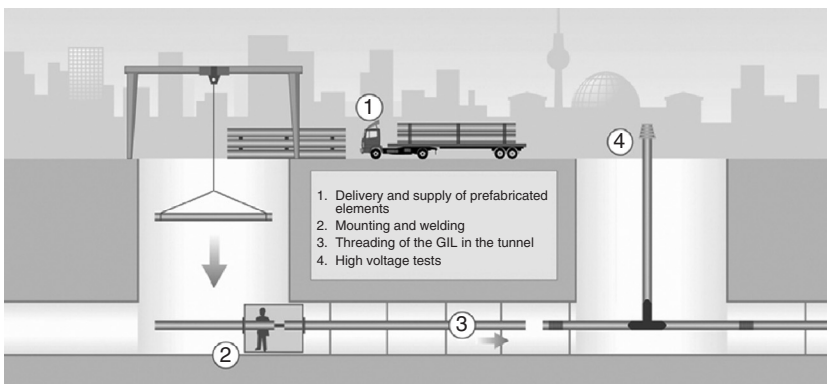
Laying and testing in a tunnel. (Courtesy of Siemens.)
